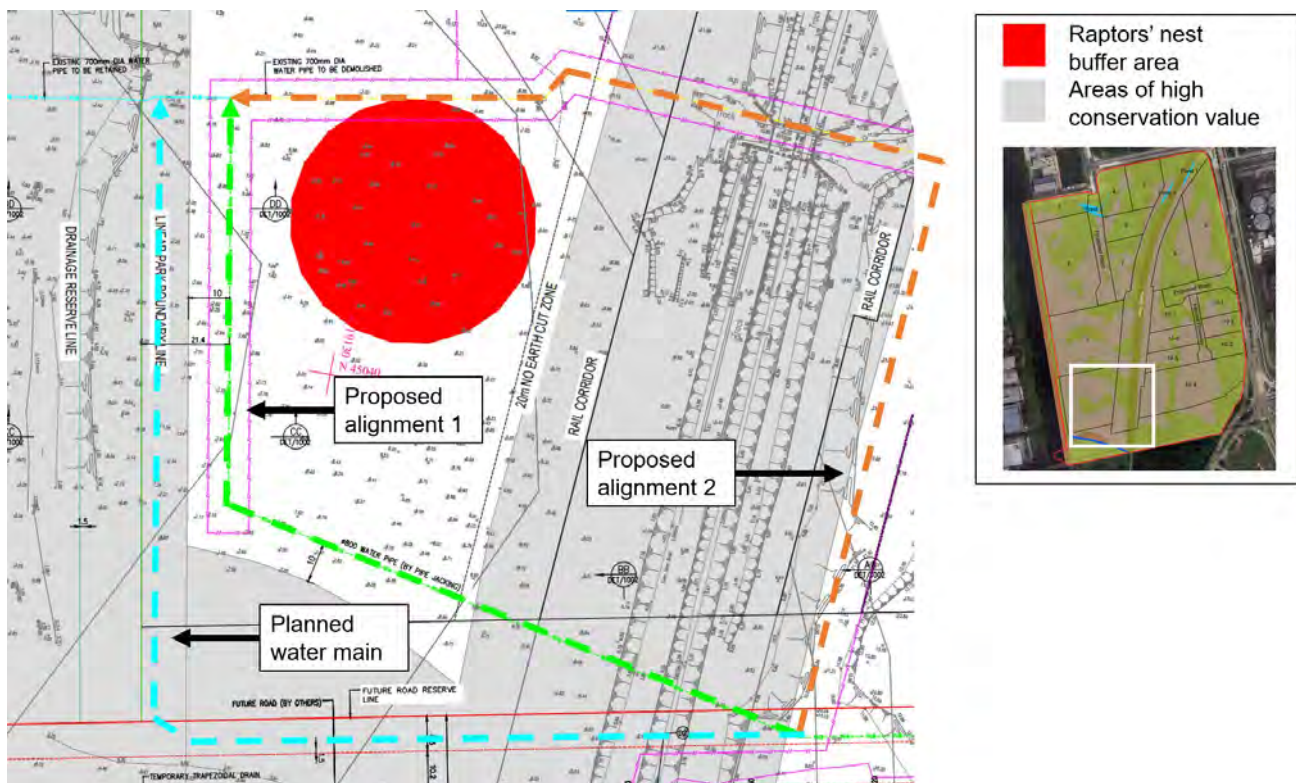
Existing plan and proposed diversion of water main (Source: CPG)
